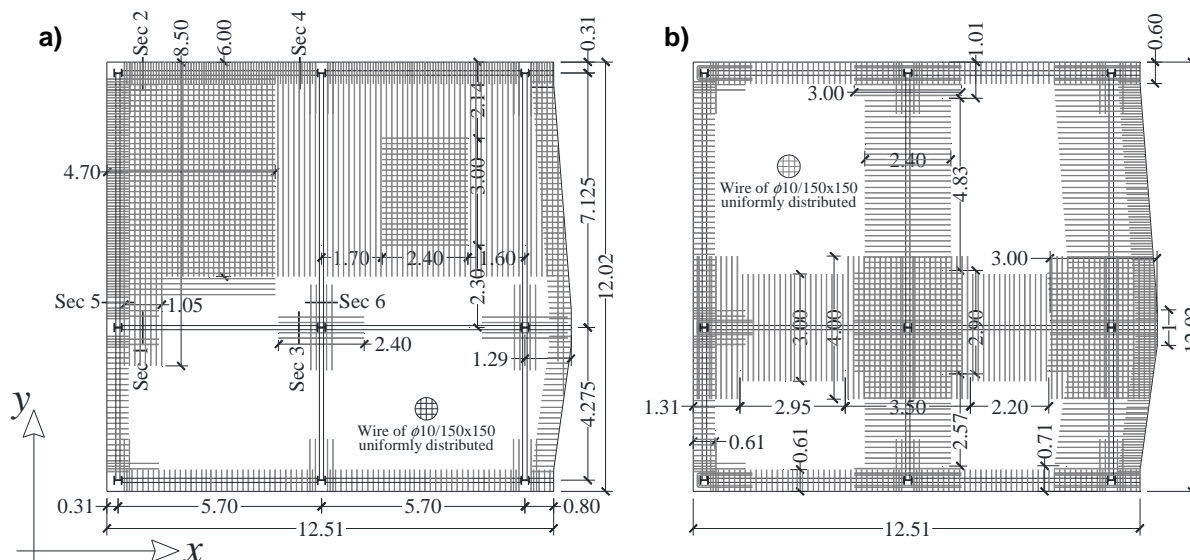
‘Asymmetric’ structure. Slab reinforcements. (a) Lower layer; (b) upper layer (dimensions in m)
